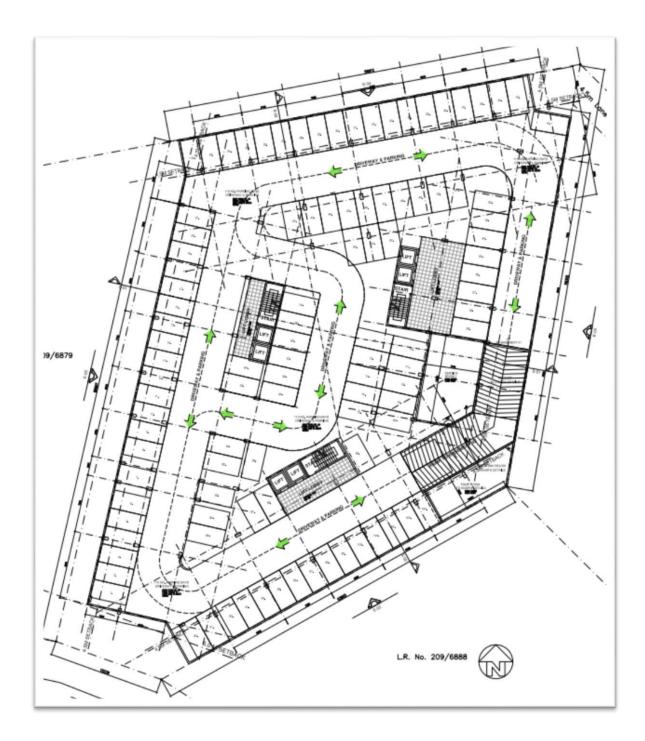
Proposed residential apartments Typical Basement 1 and 2 layout design
